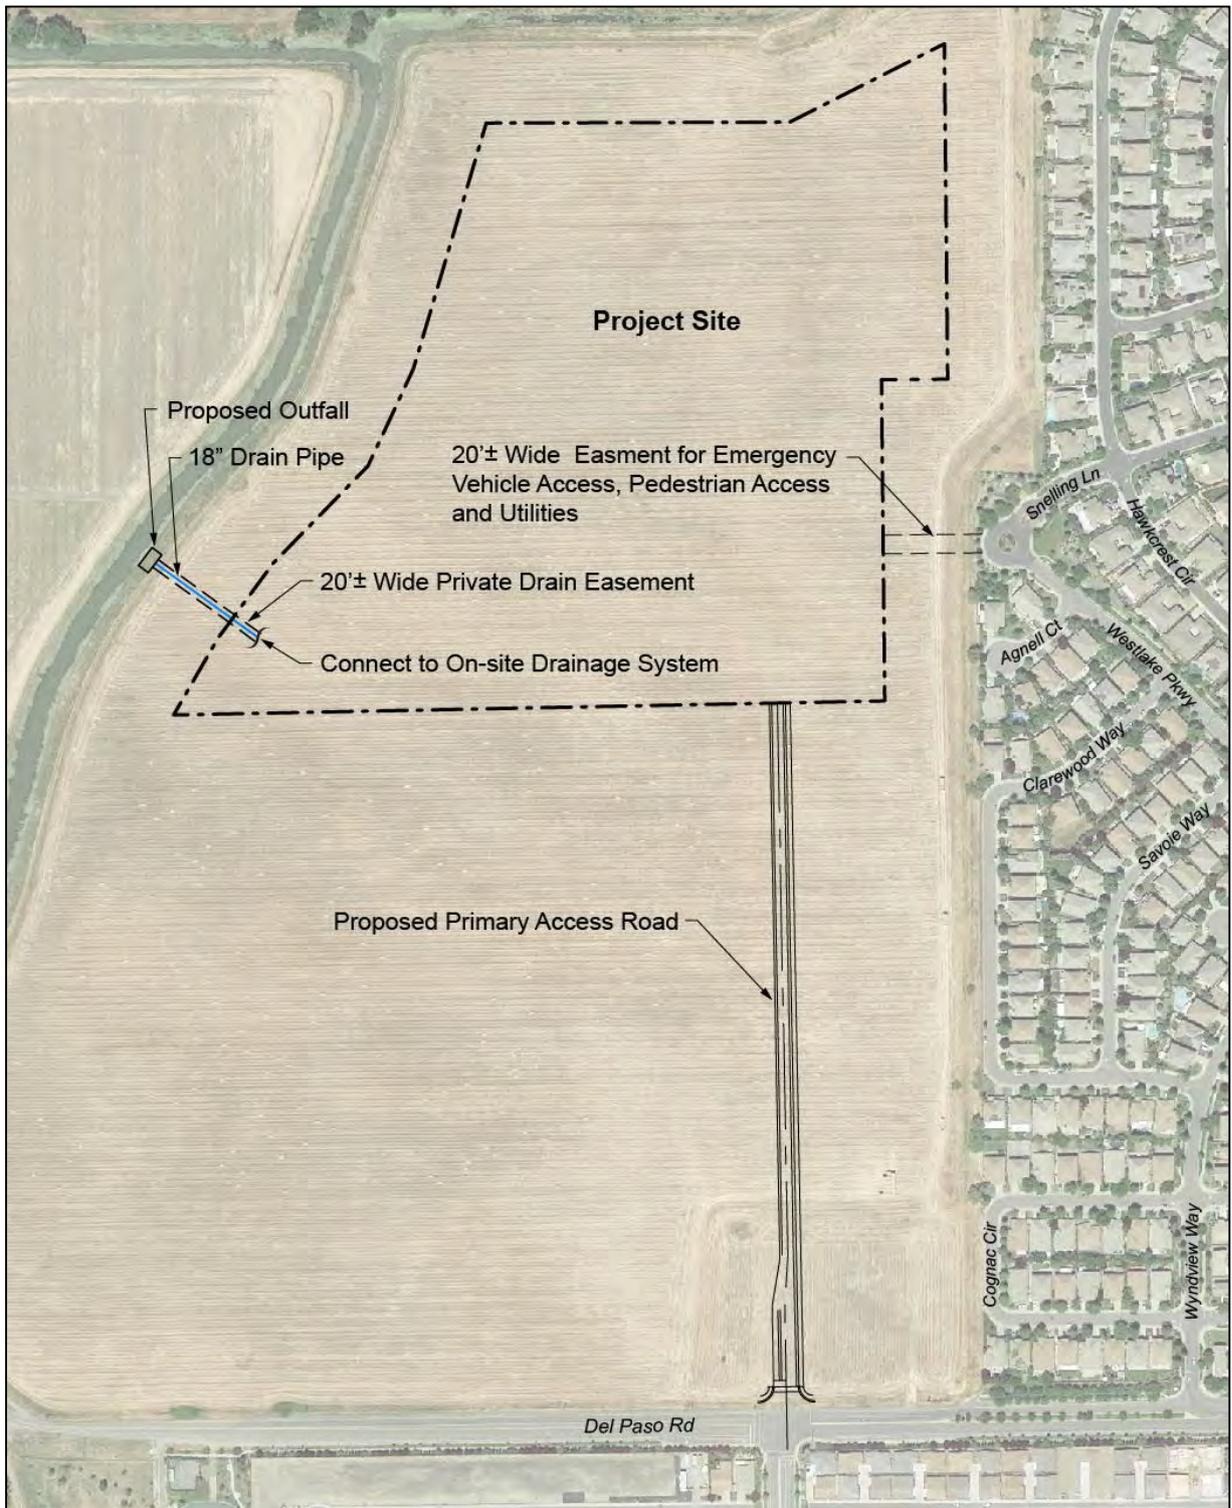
Preliminary Plan for Off-Site Improvements (Subject to Change)
